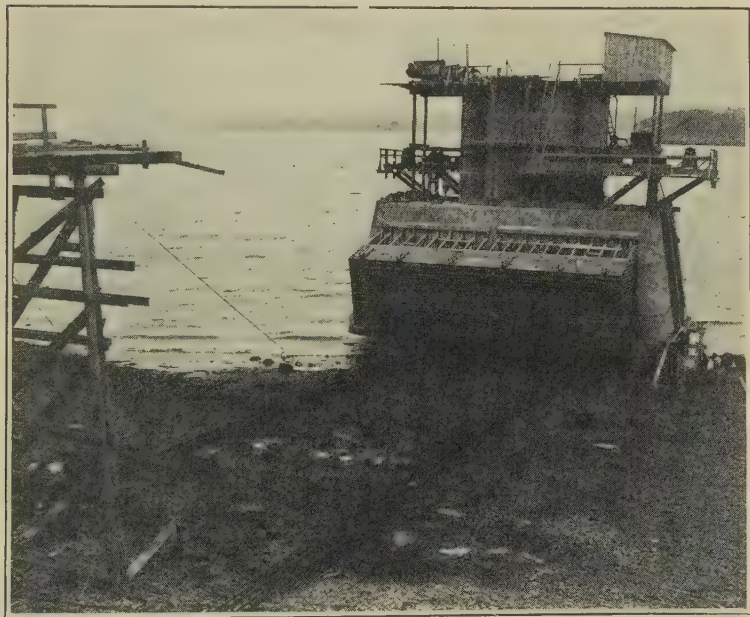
LAUNCHING REINFORCED CONCRETE CAISSON.
